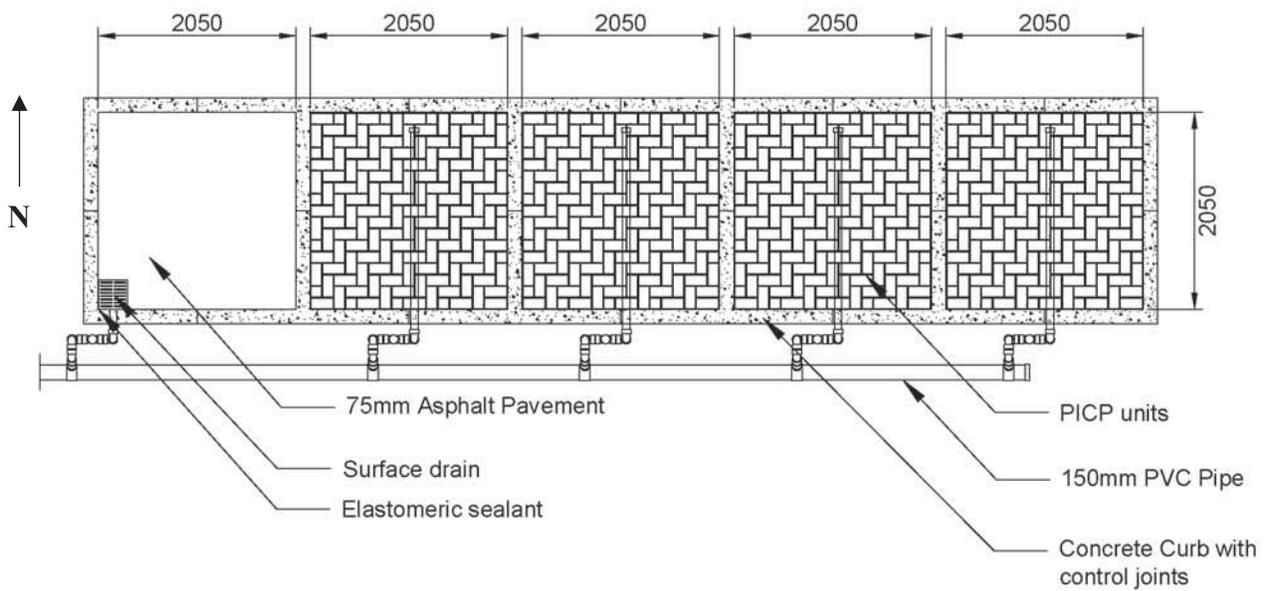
Test Pad Layout. Dimensions are presented in mm.
